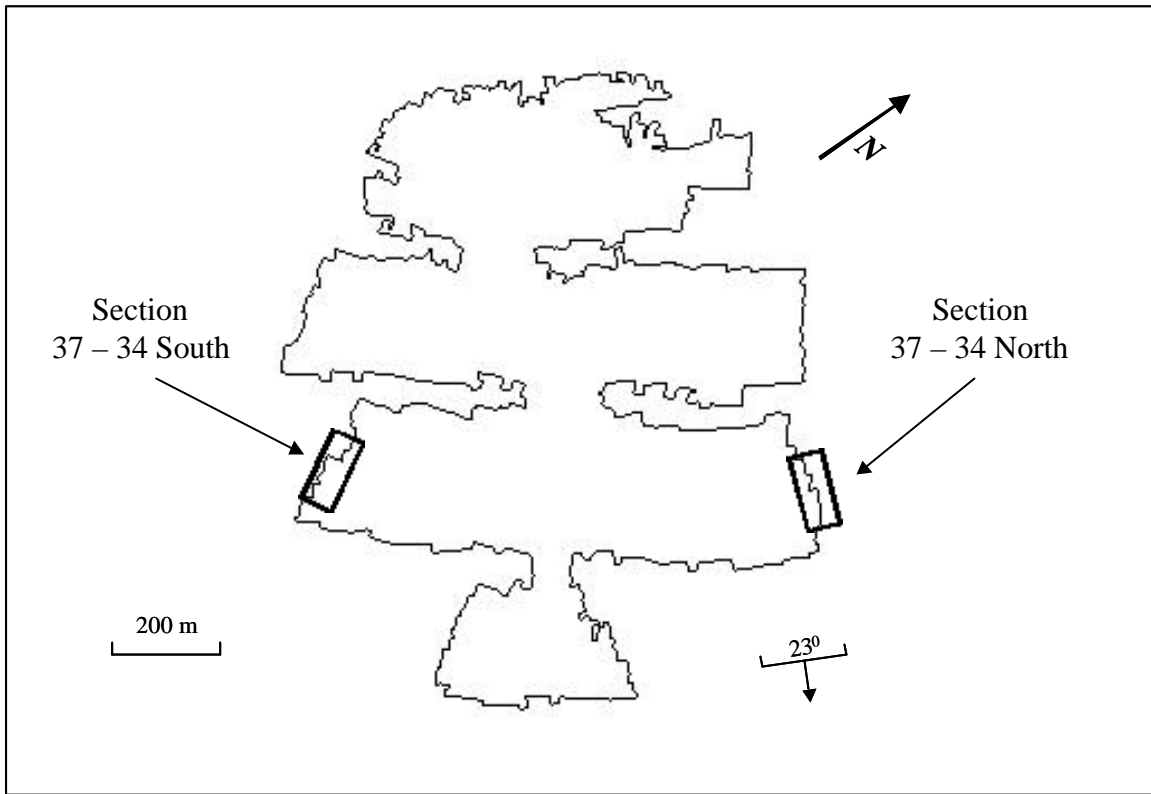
Position of the monitoring sites at Sections 37-34 South and 37-34 North
